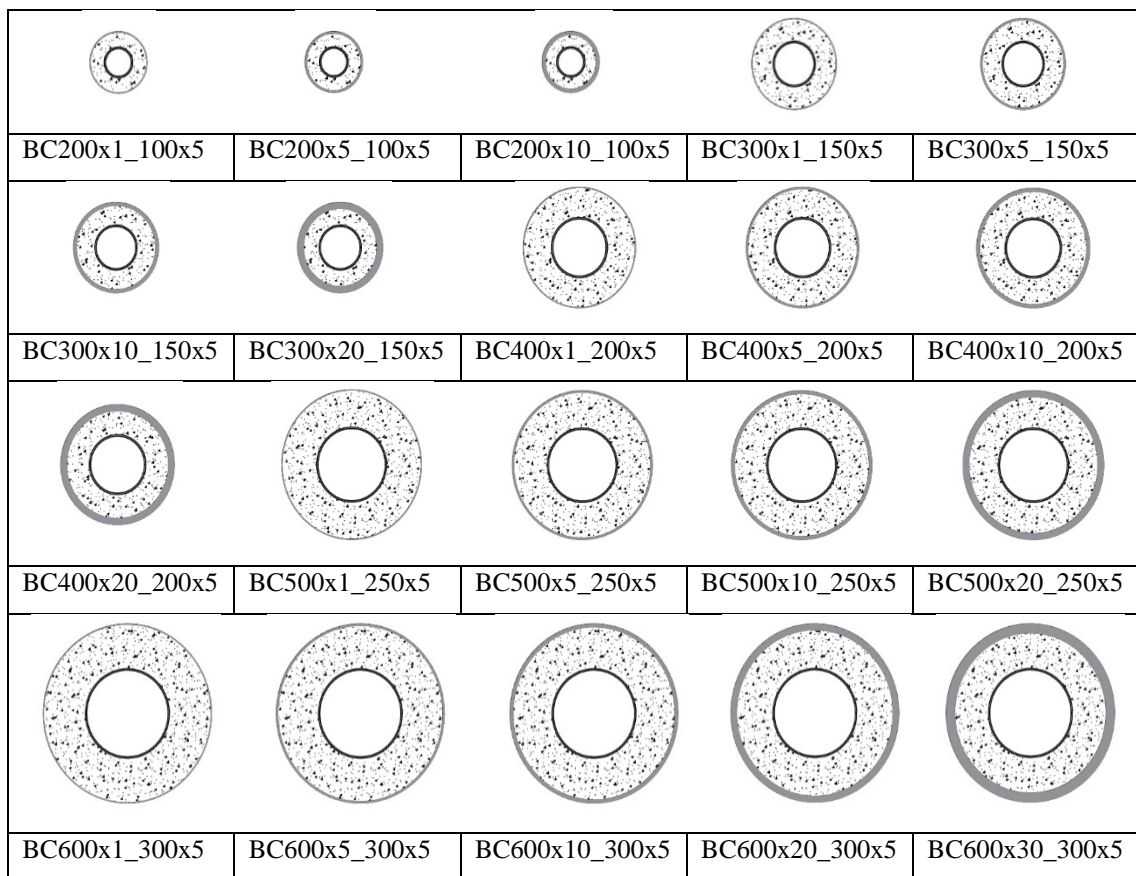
Cross-sections: CFDST beam-columns and beams CFDST stub columns.
